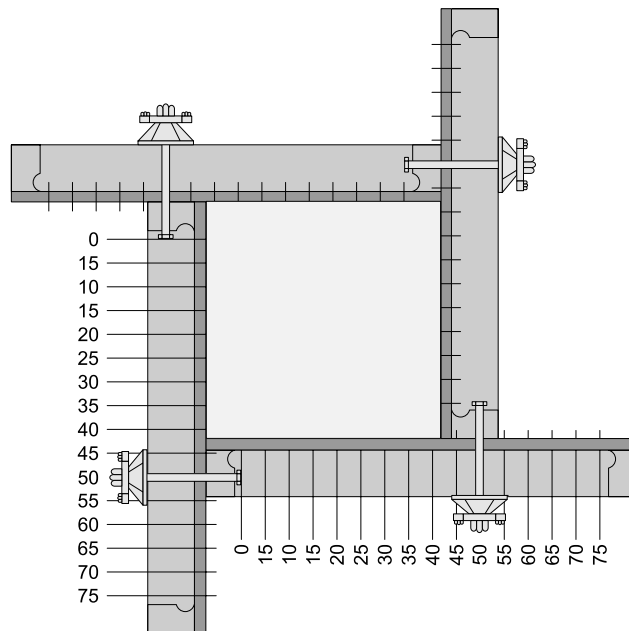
Plan of Trio Column Formwork (Courtesy PERI).
